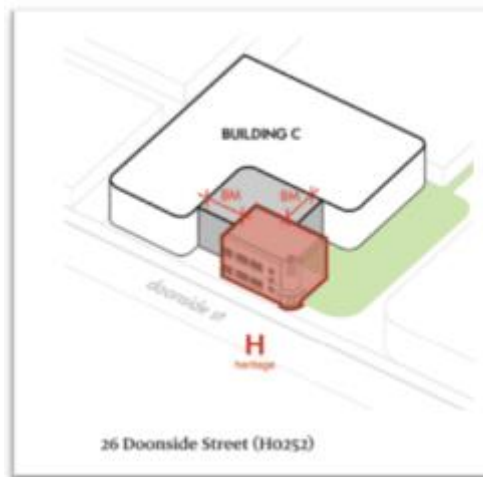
26 Doonside Street & Building C. Source: Development Plan (Gurner 2023)
